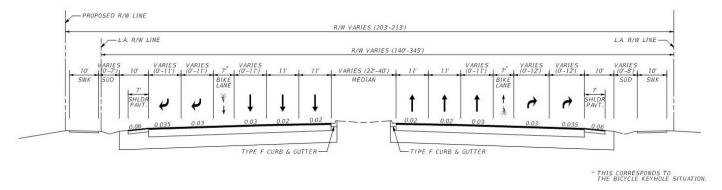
Proposed Typical Section - St Lucie West Boulevard over SR 9 / I-95
